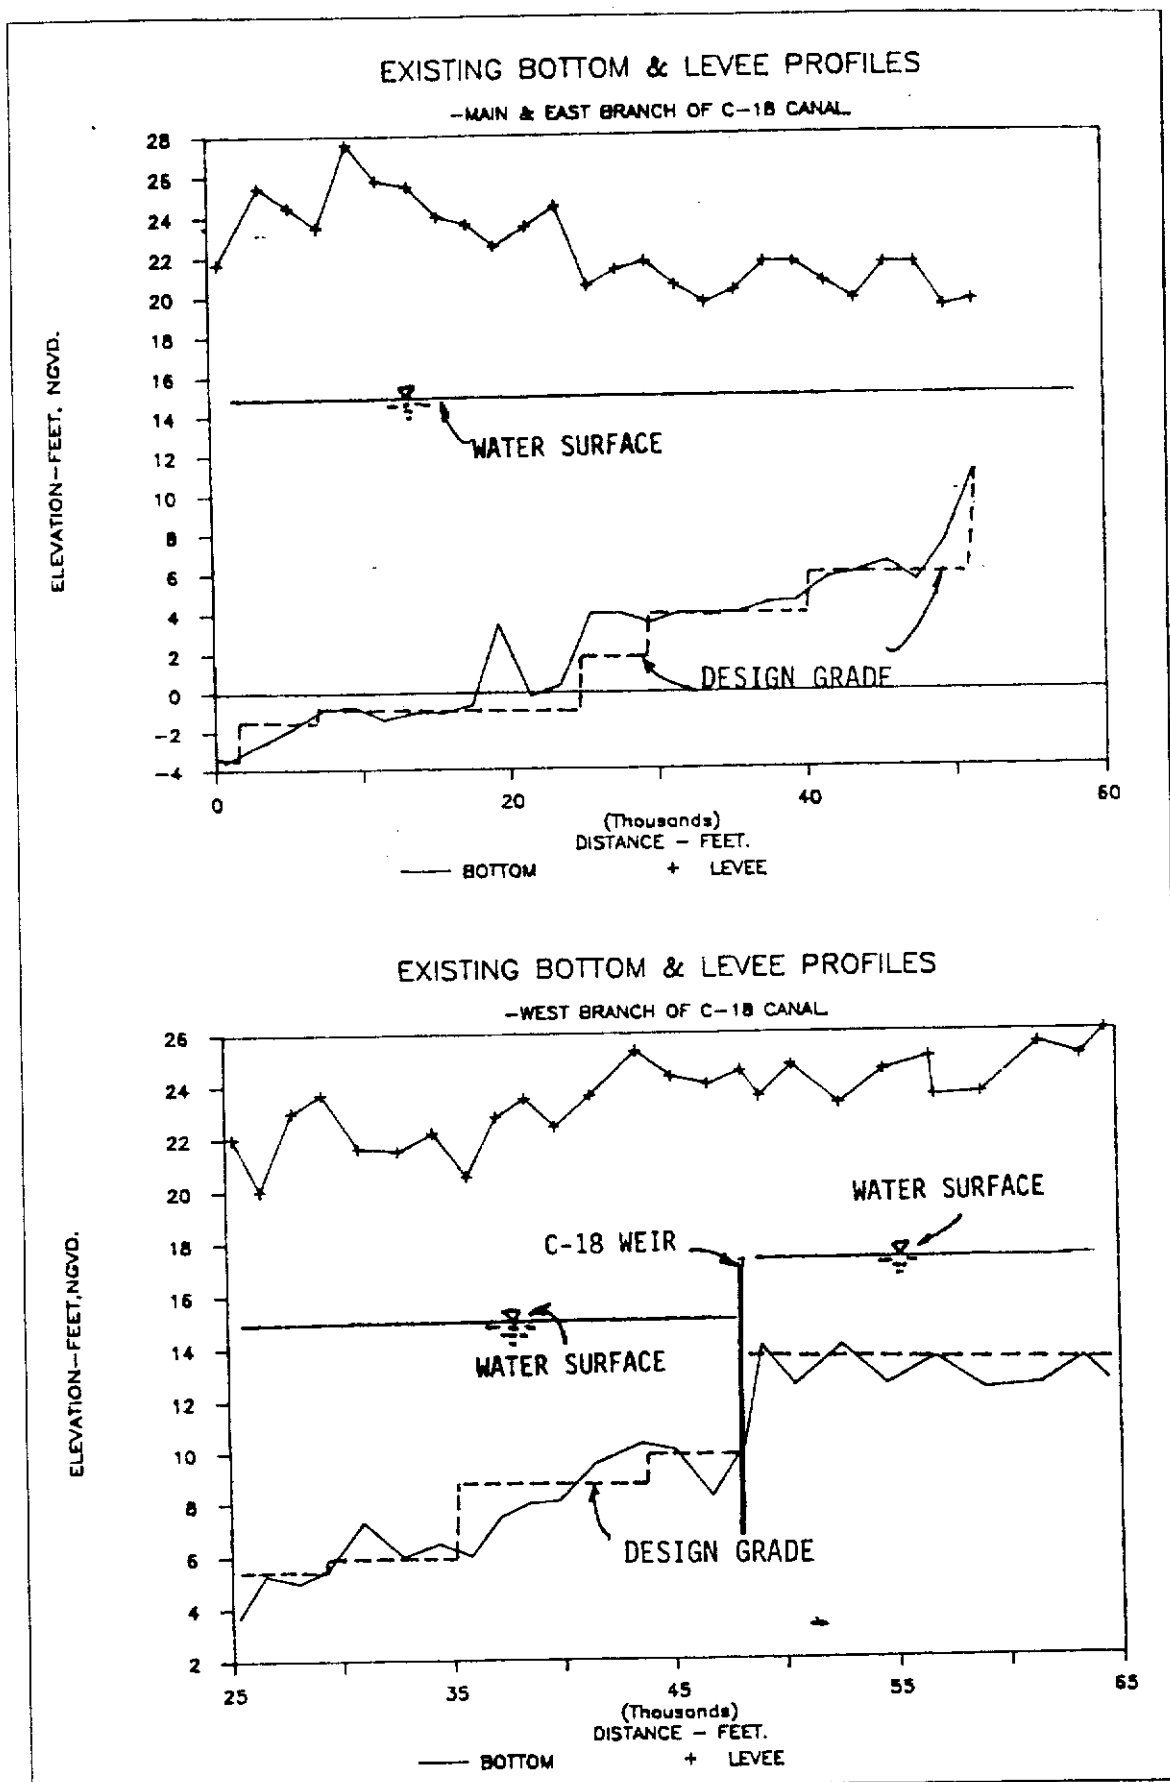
Existing Bottom and Levee Profile Along C-18
